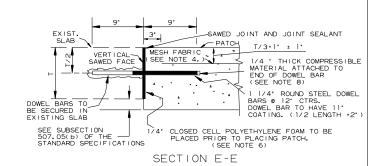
DETAILS OF PORTLAND CEMENT CONCRETE PAVEMENT PATCHING (MAIN LANES)
